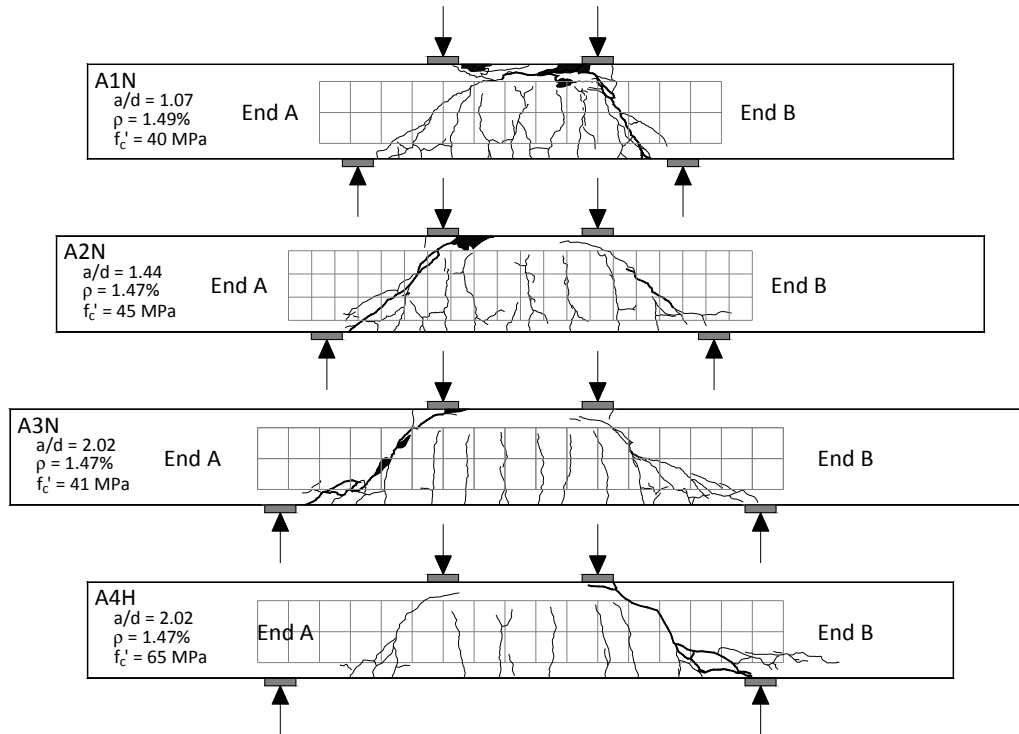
Crack diagram after failure of specimens with $h = 300$ mm.
